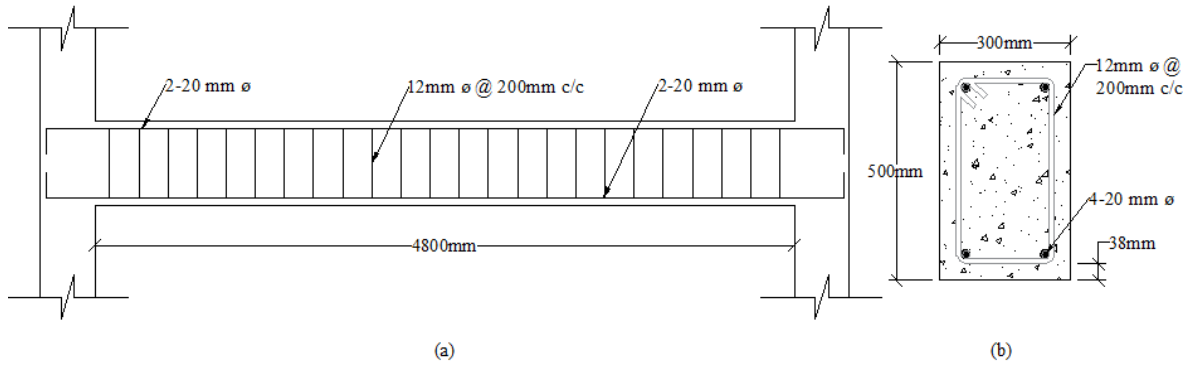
Reinforcement detailing of prototype (a) long section (b) x-section
